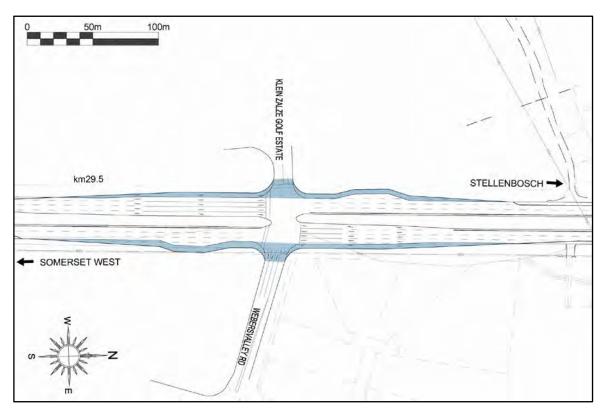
Proposed improvements at Webersvallei Road Intersection – shaded area (K&T, 2015)
